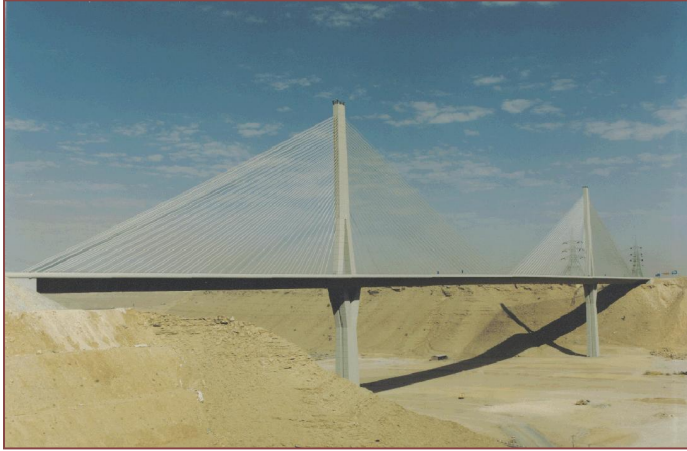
Wadi Leban Bridge: Tower geometry showing integral deck to tower connection and stay saddle detail
